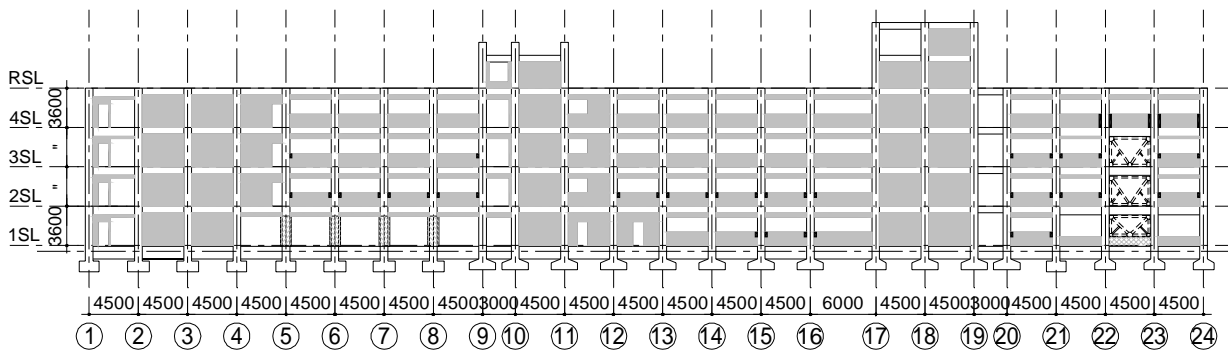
Framing elevation of G frame (T-1 building of T-High school)
